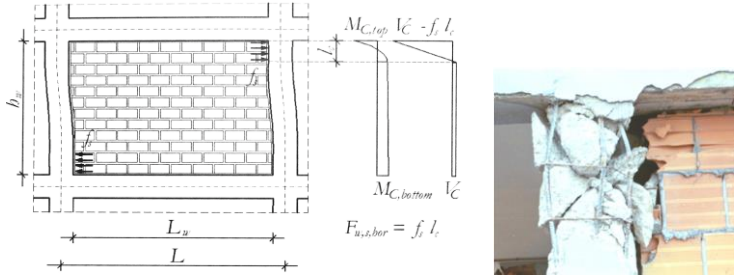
On the left side: Schematic representation of forces induced in RC columns by compressed diagonal struts of masonry infills. From [39]. On the right side: Example of Local column damage caused by infill corner crushing after the Molise earthquake, in 2002. From [40].
